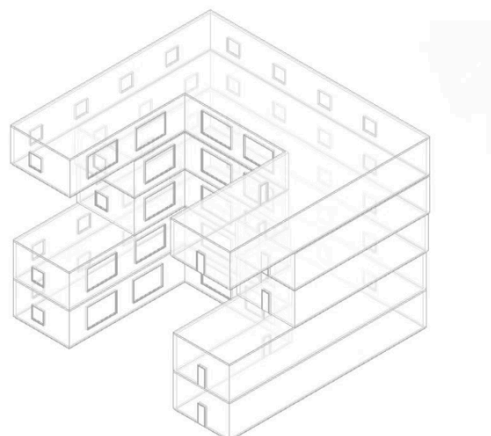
Design 3: a vertical and enclosed building (picture credit: original)
